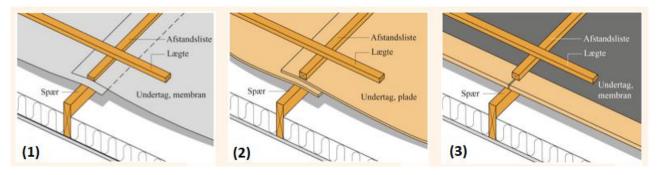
Types of roof underlayment. (1) membrane only, (2) board sheathing (3) board sheathing and membrane (Praxis 2014)
